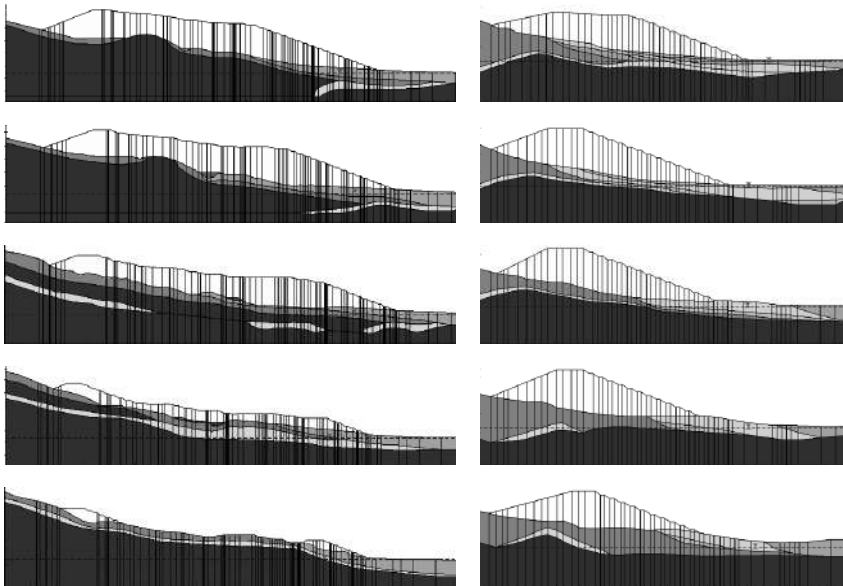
Sections from models of Zone 1 (left) and 2 (right). Note mine waste rock layout and soil layer variability.
